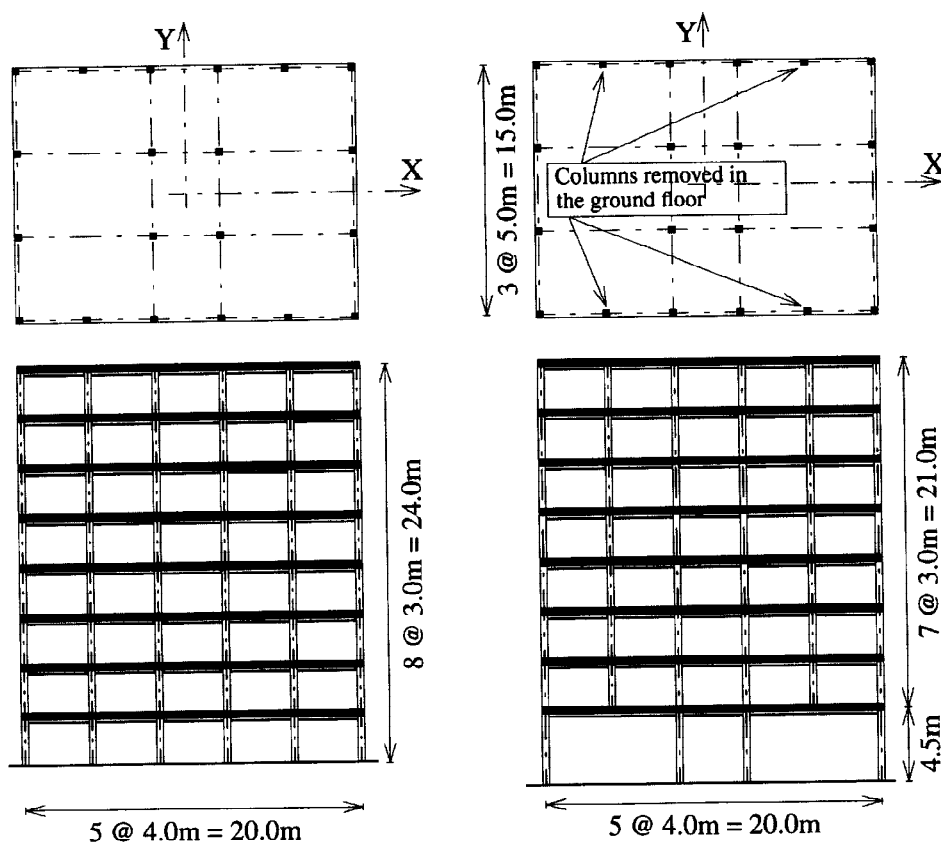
Structural configurations: a) Regular structure C2 and b) Irregular structure C6
